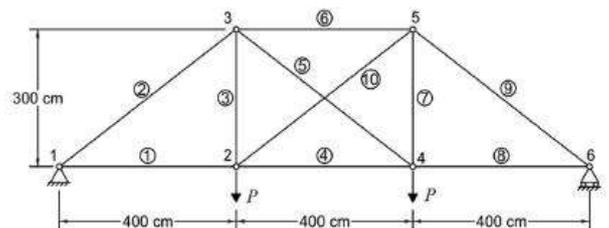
Structural scheme of the flat truss (Li e Zhang [14])
